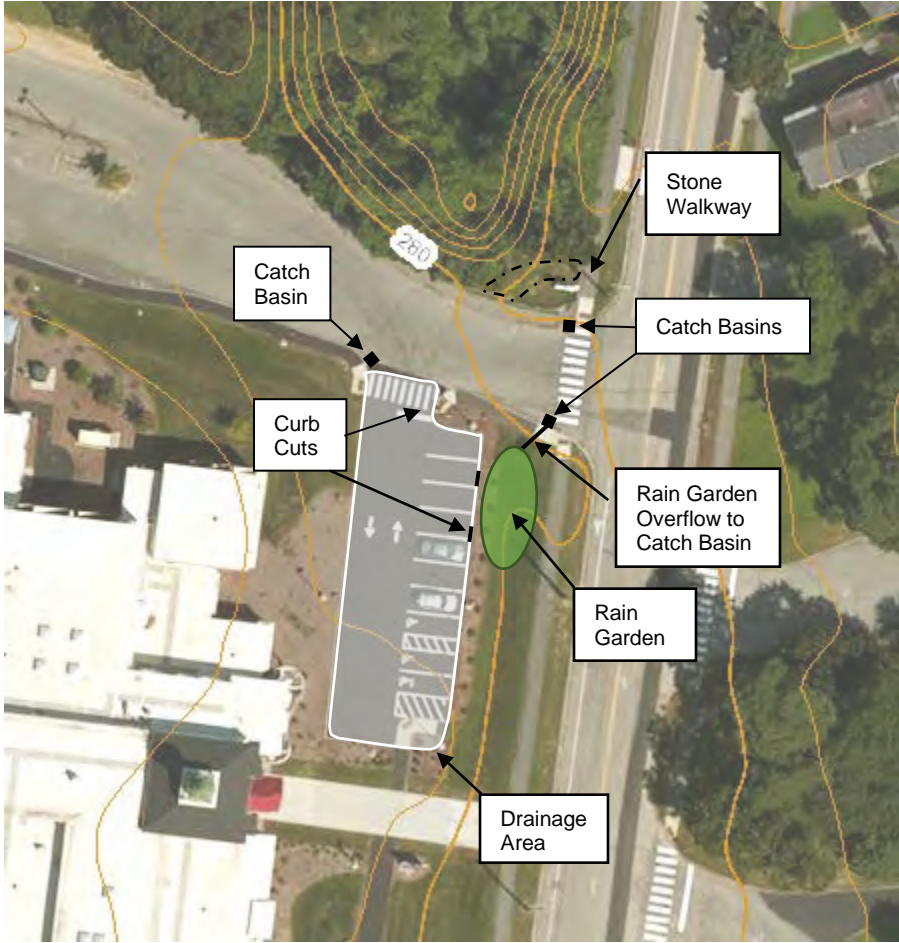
Proposed BMP configuration at Abbot-Downing School
